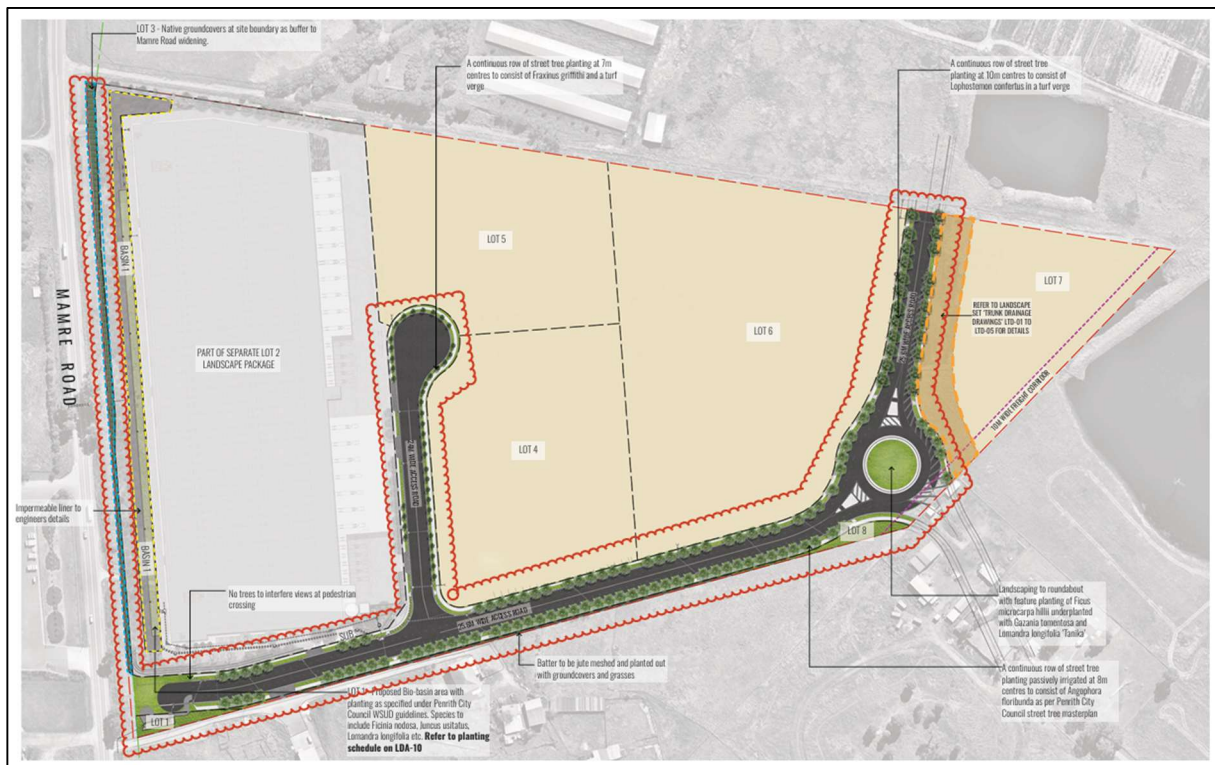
Landscape Masterplan (Source: Geoscapes, 2026)
